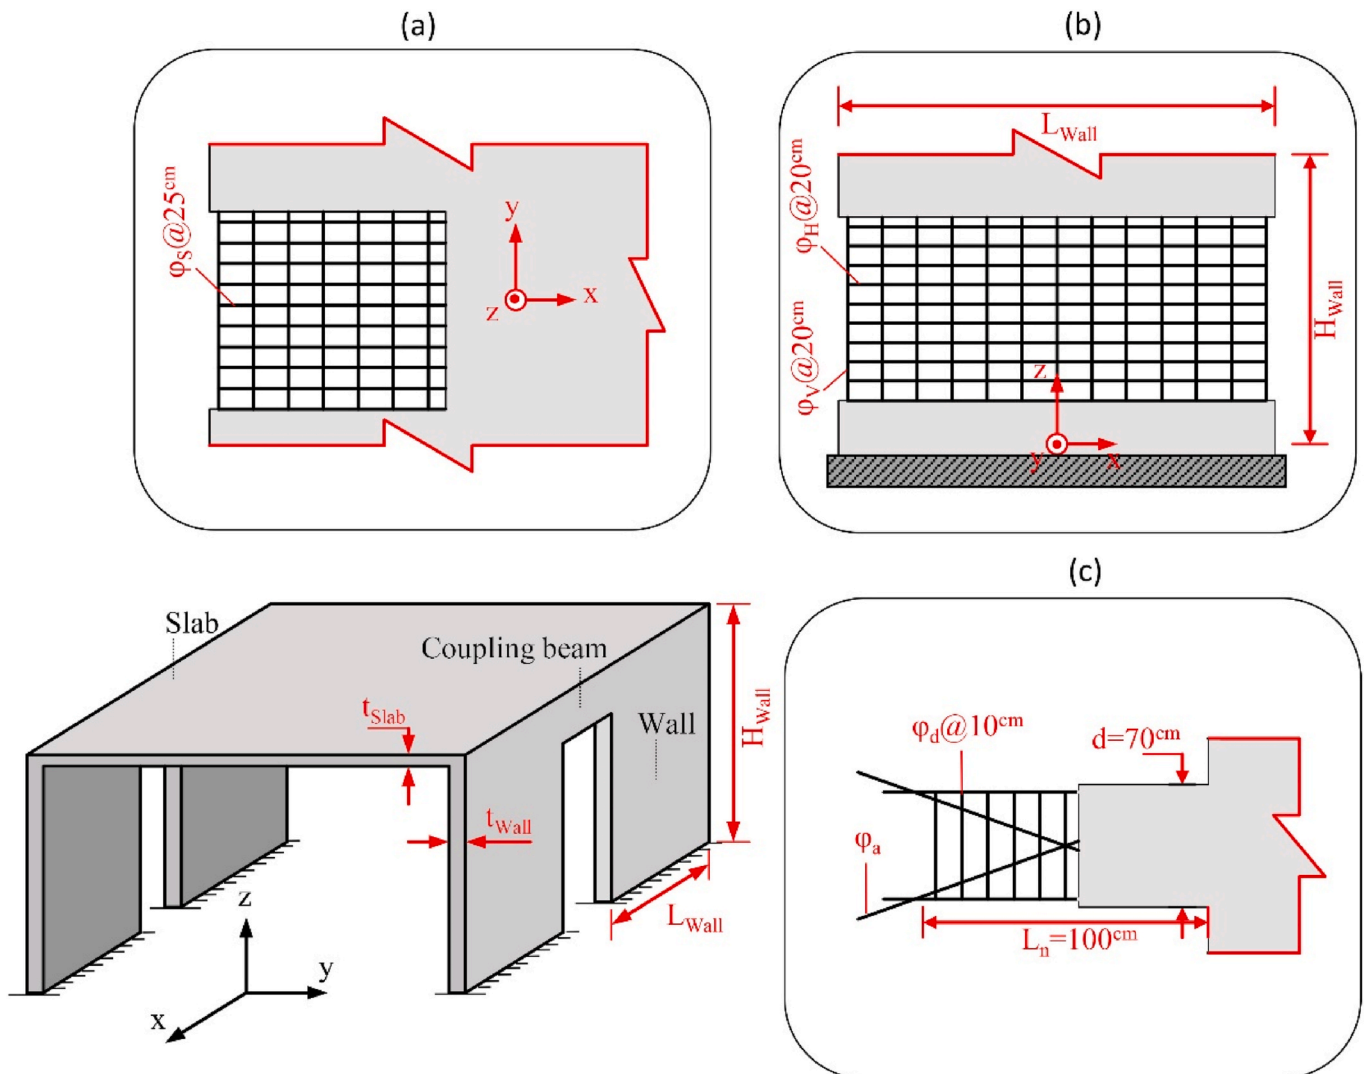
Reinforcement details of structural elements (a) Slabs (b) Walls (c) Coupling beams.
